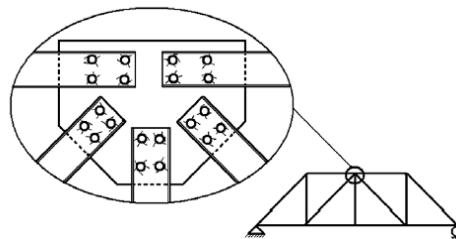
A schematic picture of fatigue damage in a truss joint (Mehrjoo *et al.* 2008)
